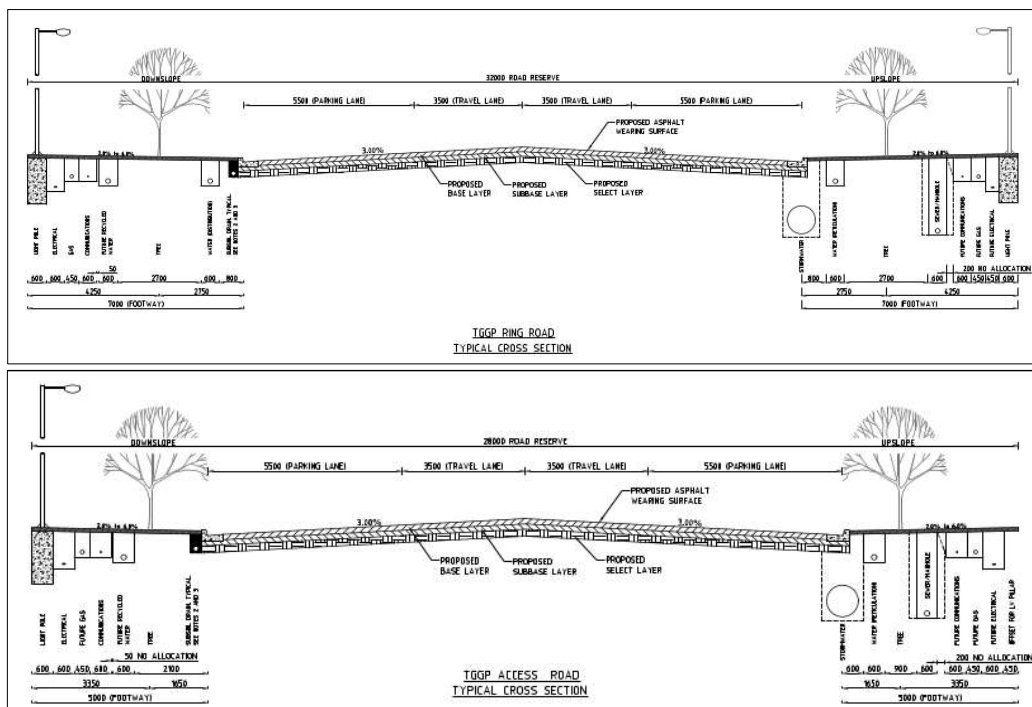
A – Typical Road Cross Sections – TGGP Ring Road (Bandaar Drive)
